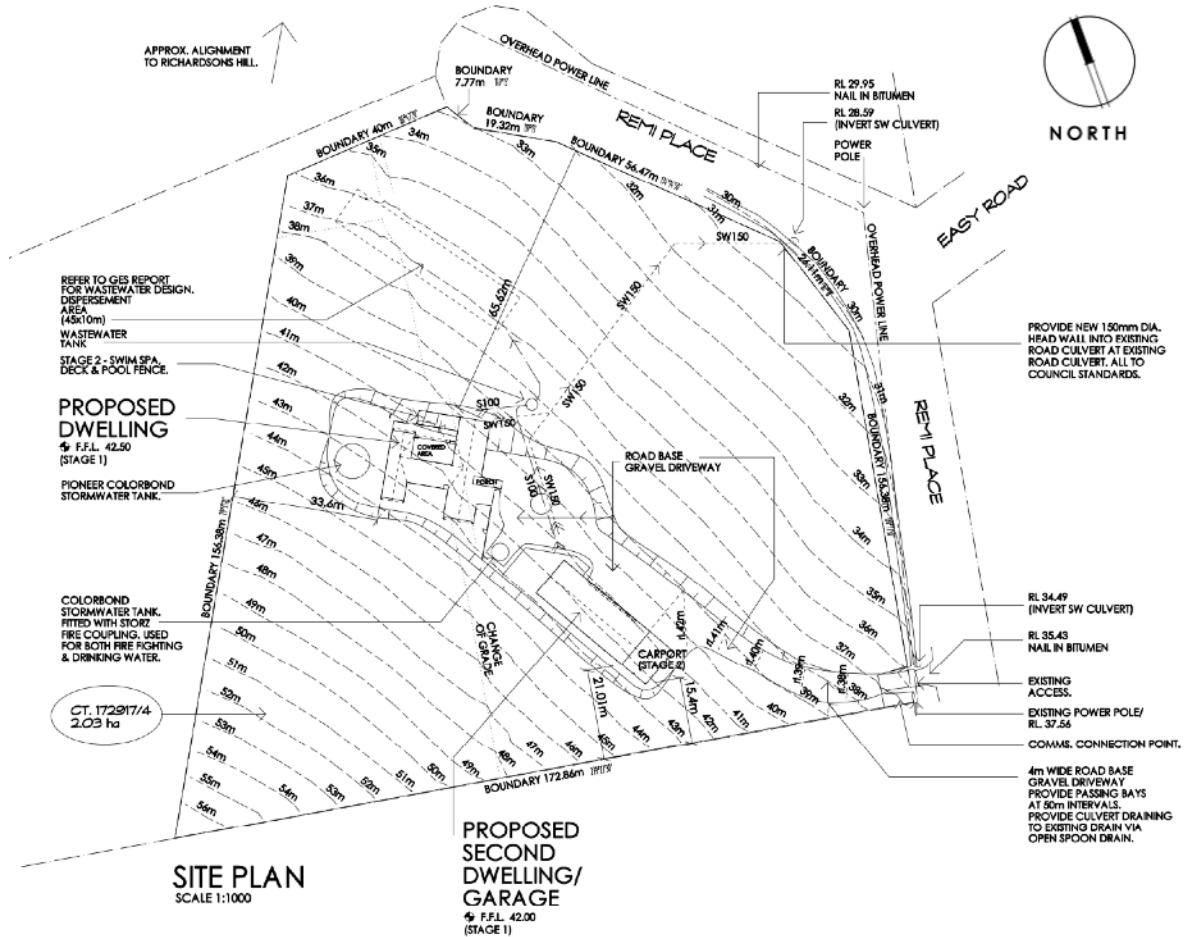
PROPOSED DWELLING SITE LAYOUT
